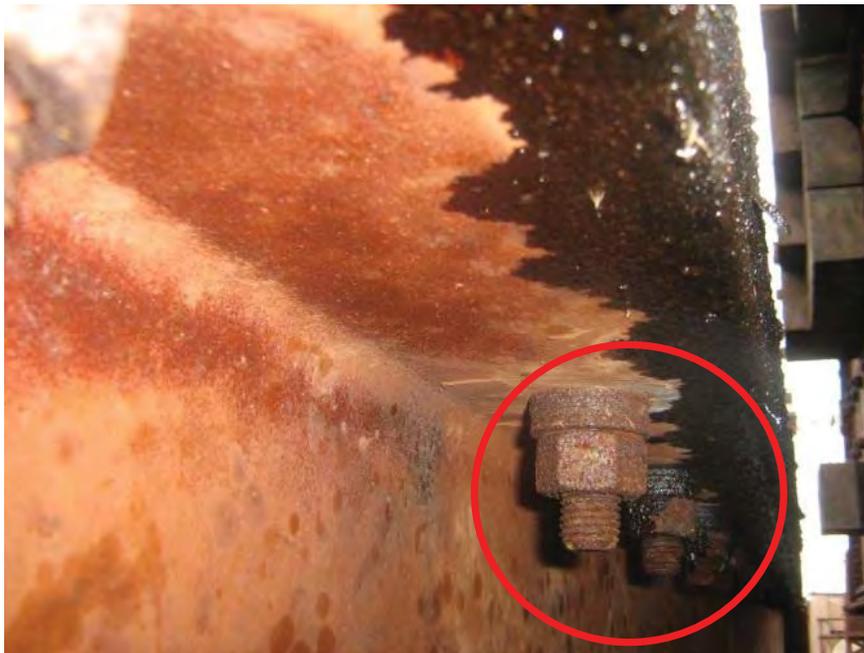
South Leaf, South Rack (Note corrosion on fasteners).
